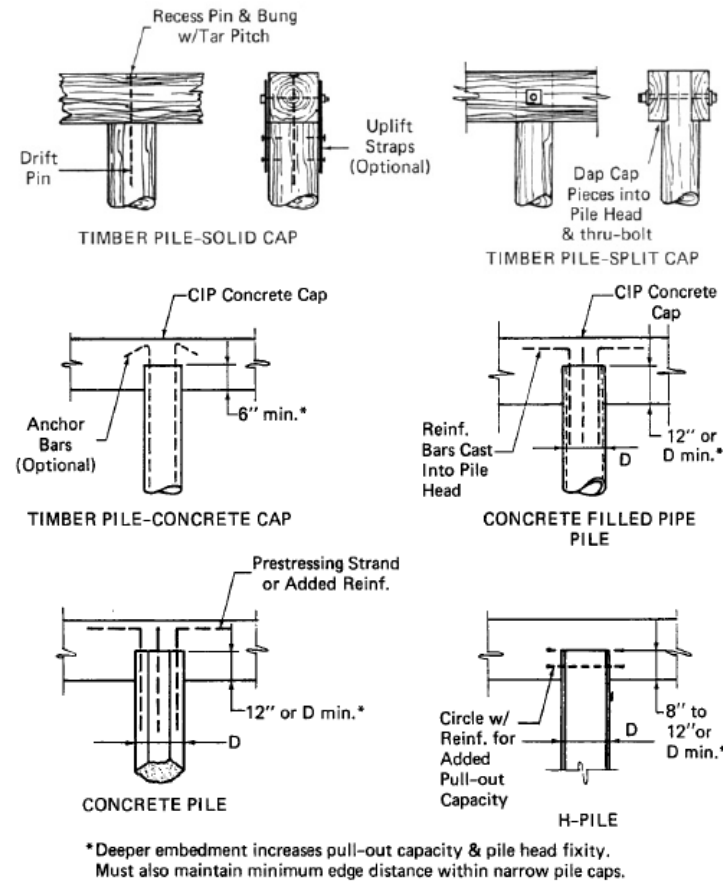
Pile head connection details (Gaythwaite, 2004: 244)
